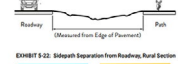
Sidewalk Separation from Roadway, Rural Section
